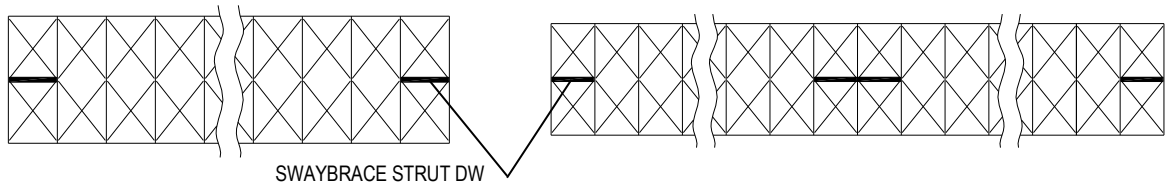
POSITION AND CONNECTION OF THE SWAY BRACE STRUT
